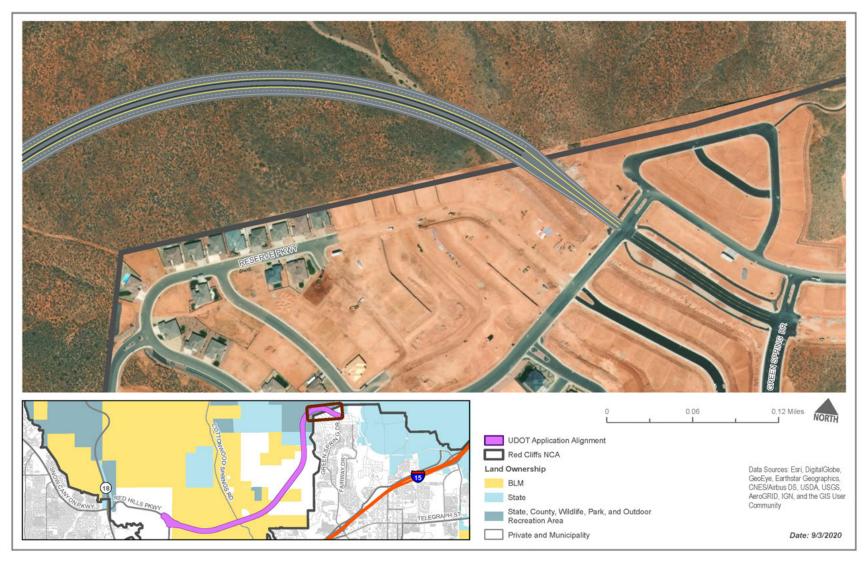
UDOT Application Alignment Plan View (9 of 9)
